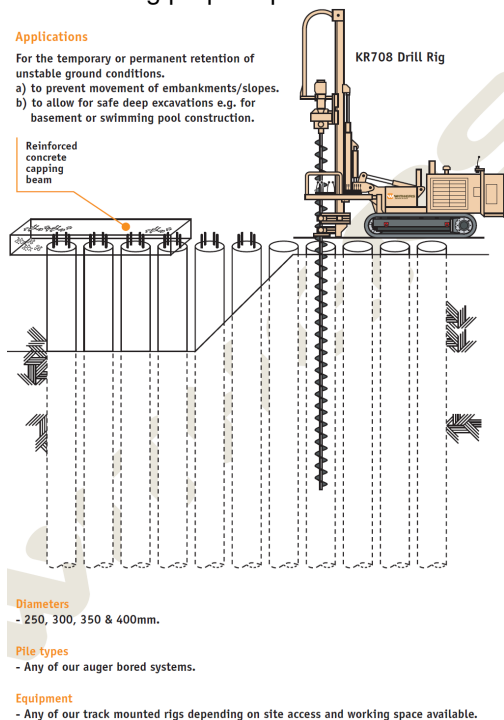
Typical piling rig to form the temporary contiguous piled wall- Courtesy of Withers Ltd.
